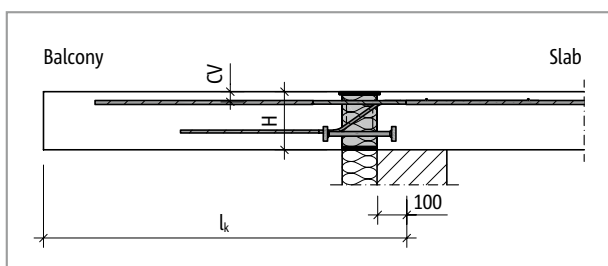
Schöck Isokorb® XT type K-M11: Static system
